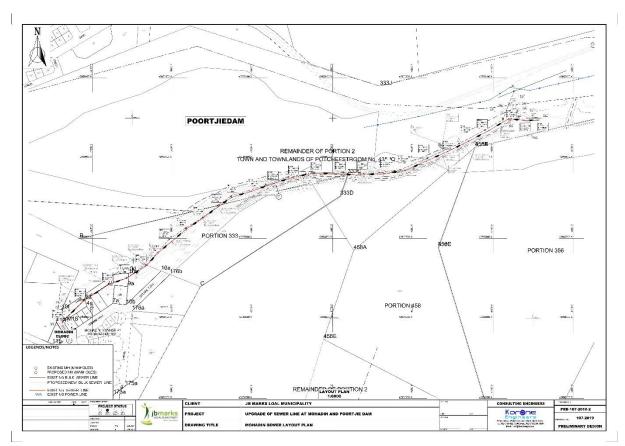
Proposed Sewer Layout Plan (refer to Appendix A for A3 maps).
